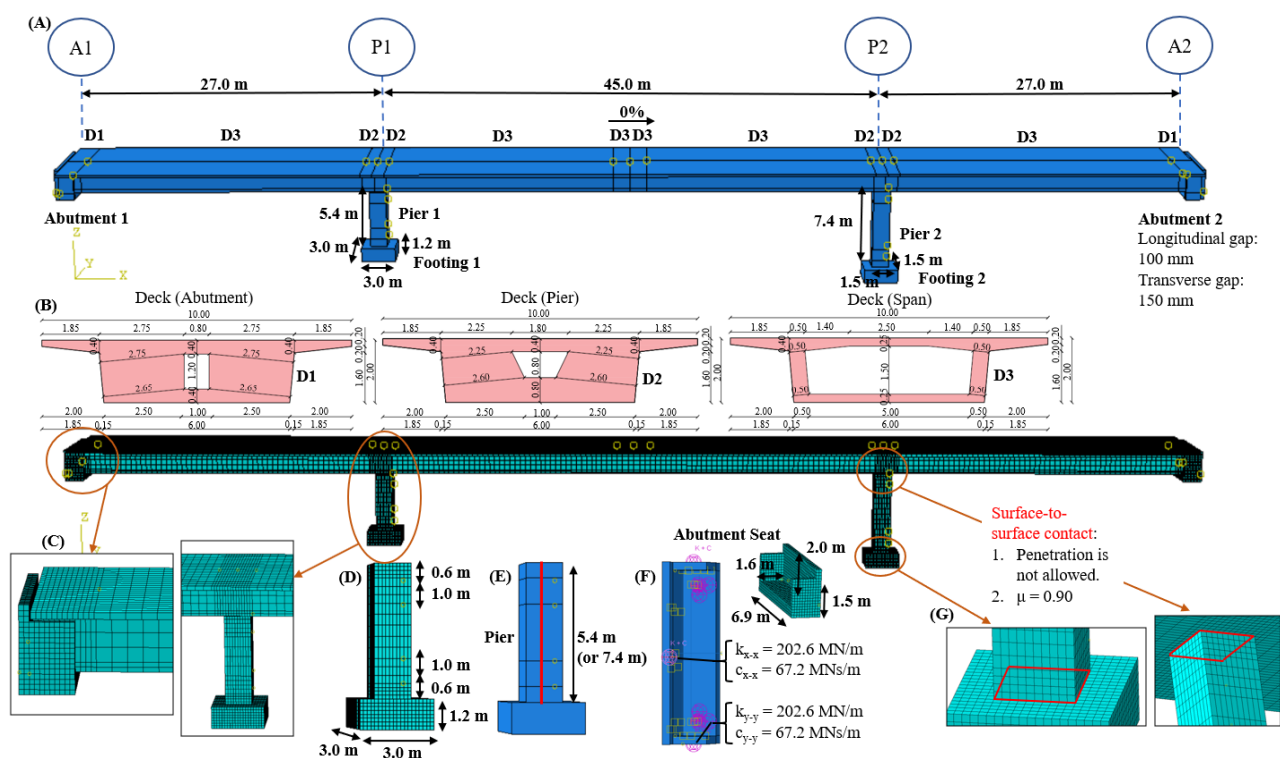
(A) Layout of the bridge with structural rocking isolation, (B) deck cross-sections, (C) superstructure mesh and mesh at the contact regions, (D) mesh of foundation-rocking pier, (E) linear beam element of the piers, (F) layout of the abutment-backfill system and (G) contact interactions to ensure rocking motion.
